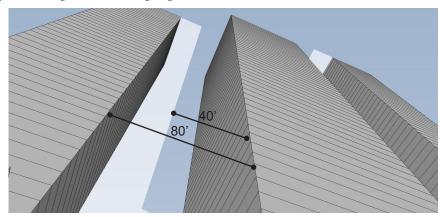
Skyview - Proposed Maximum Building Height 600' As building height increases, opportunity for light and sky views diminishes. Maintaining a minimum tower separation requirement ensures access to light and sky views that would otherwise be diminished.
